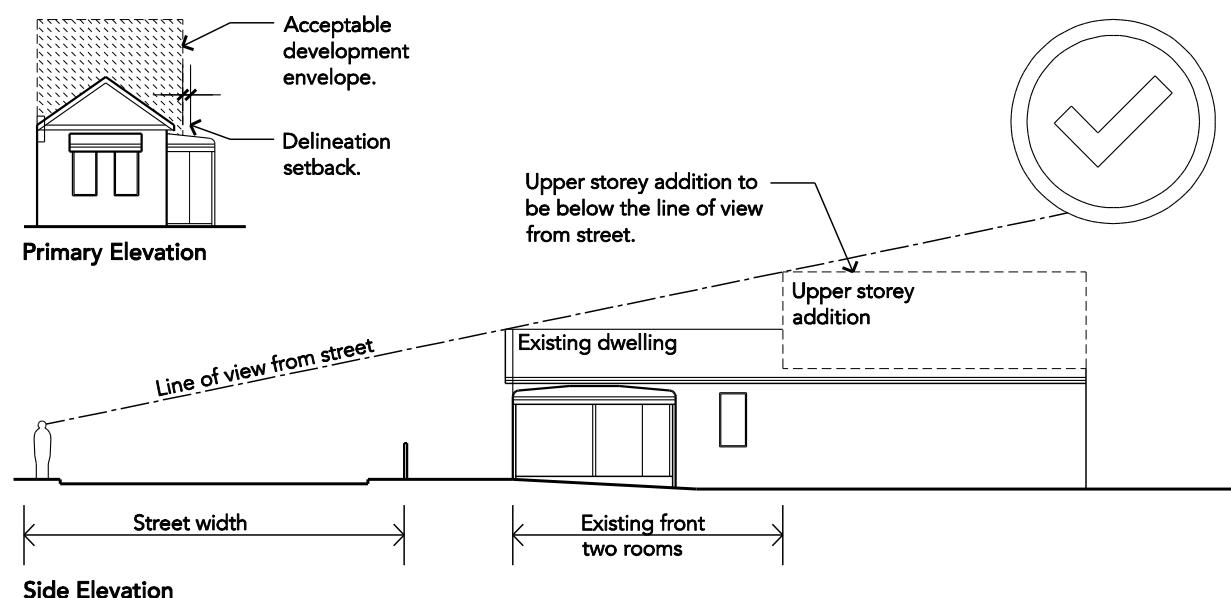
Elevations illustrating compatible alterations and additions – *Griffiths Architects 2012*. The actual configuration of such an extension is subject also to R Code setback provisions.
